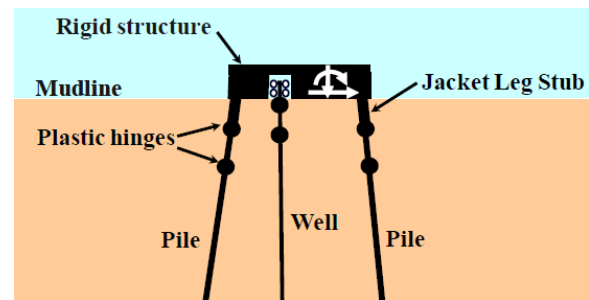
Simplified foundation collapse model (OTRC, 2009).
